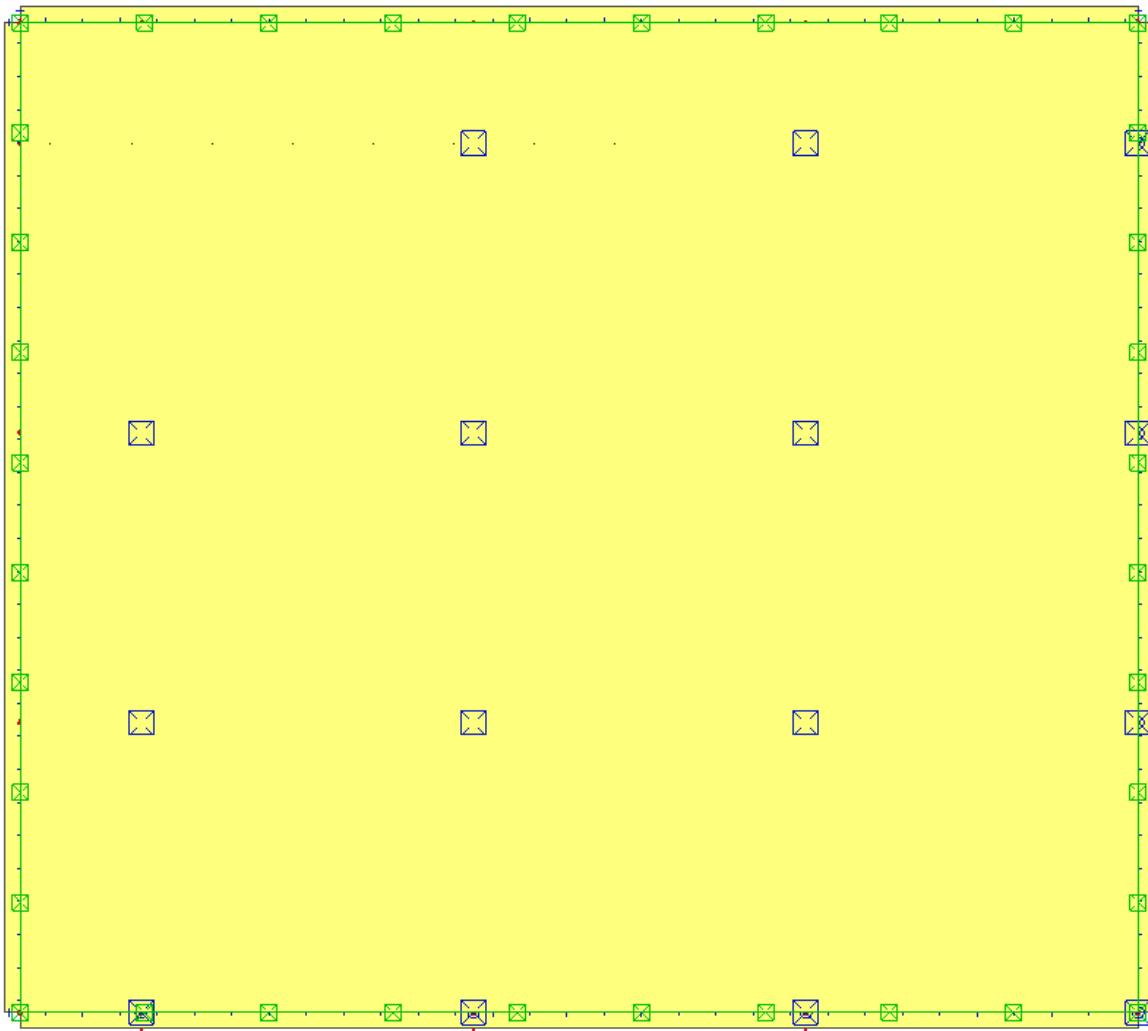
SCIA model, anchors placed under the Flexbase floor
